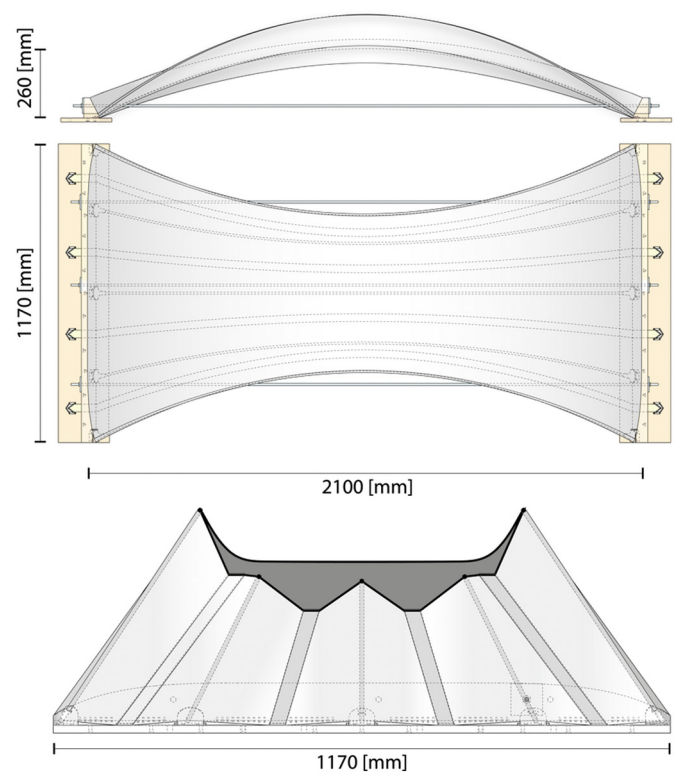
Elevation, plan and cross-section views of the final bridge design.
